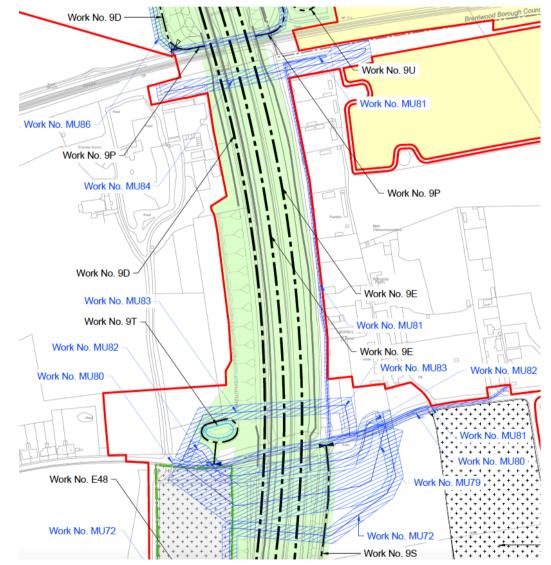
Extract from Land Plans Volume C, Sheet 44
